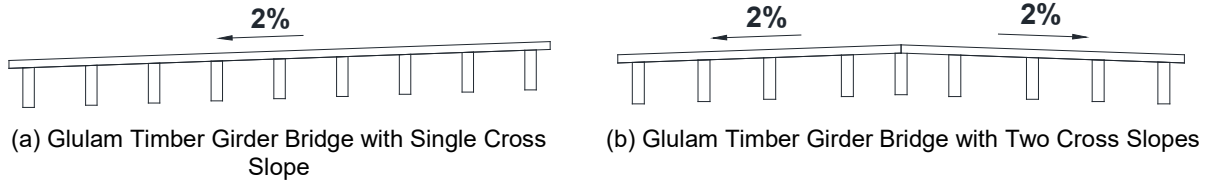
Cross-Section of Glulam Timber Girder Bridges
